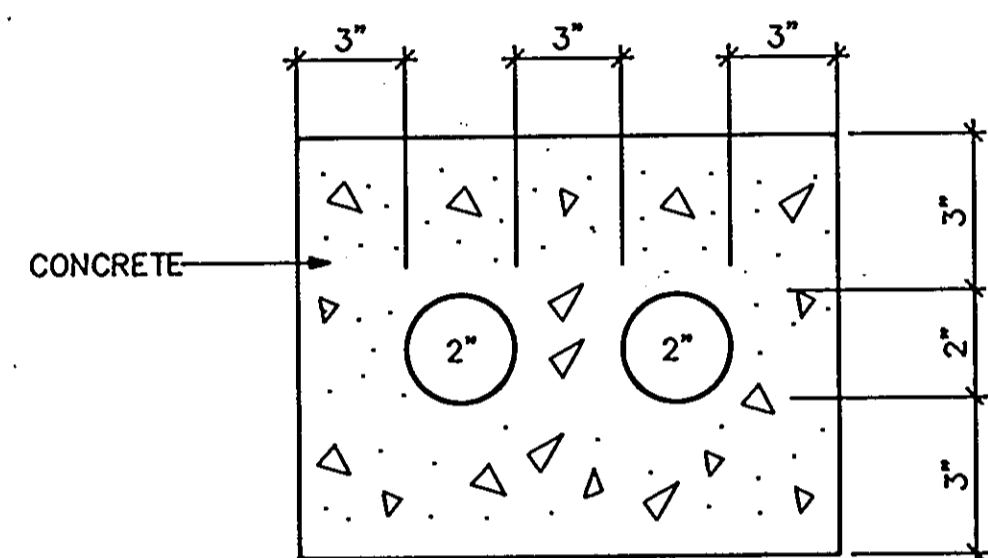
DETAIL - POLE RISER OVERHEAD TO UNDERGROUND CONSTRUCTION
